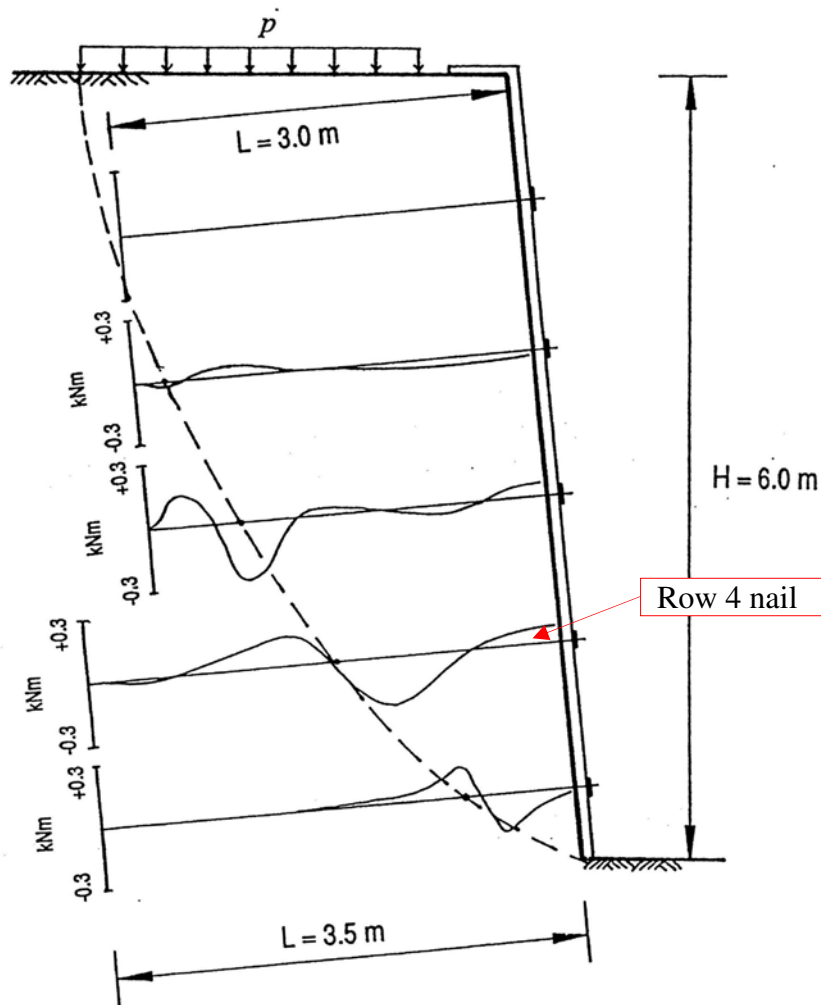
Bending moment distribution at collapse of soil nailed wall (after Gässler 1987)
